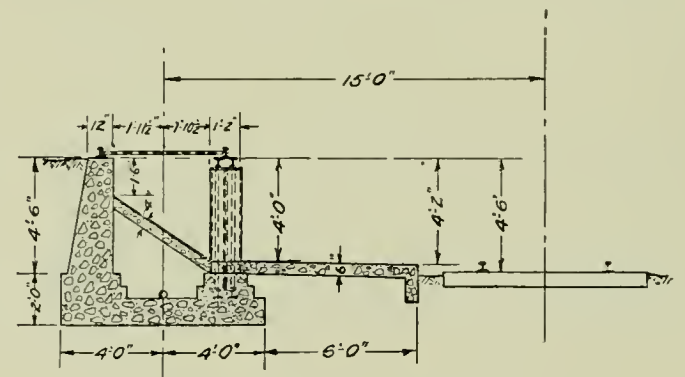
A Dry Pit Built by the Bangor & Aroostook
